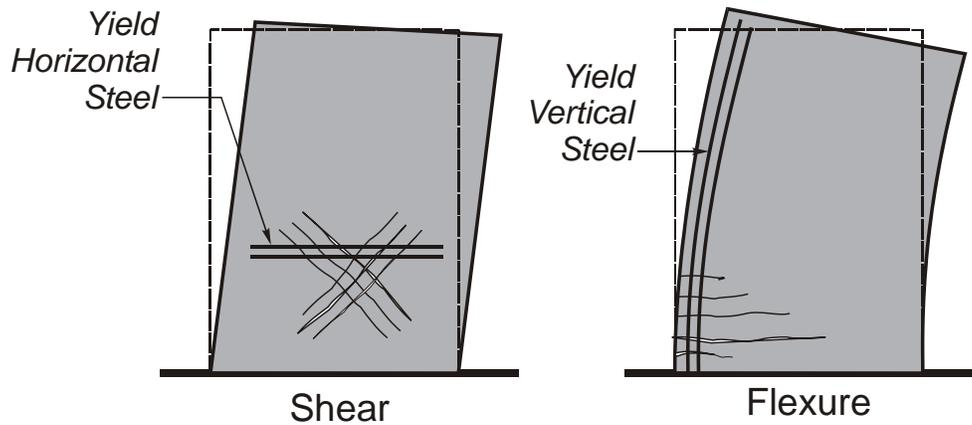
Deformation Modes and Failure Patterns of Masonry Shear Walls (DORMS, Figure 3.8.1)
